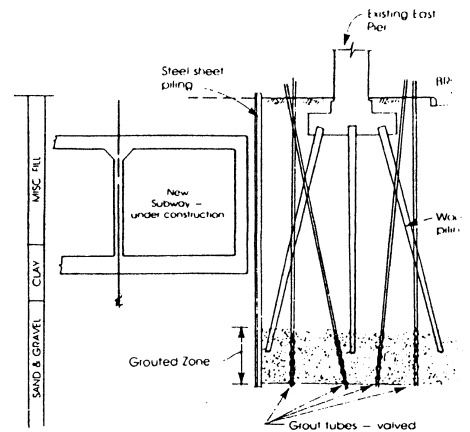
Grouting of sand and gravel to safeguard piles subject to external effects, Philadelphia (Karol, 1983)
